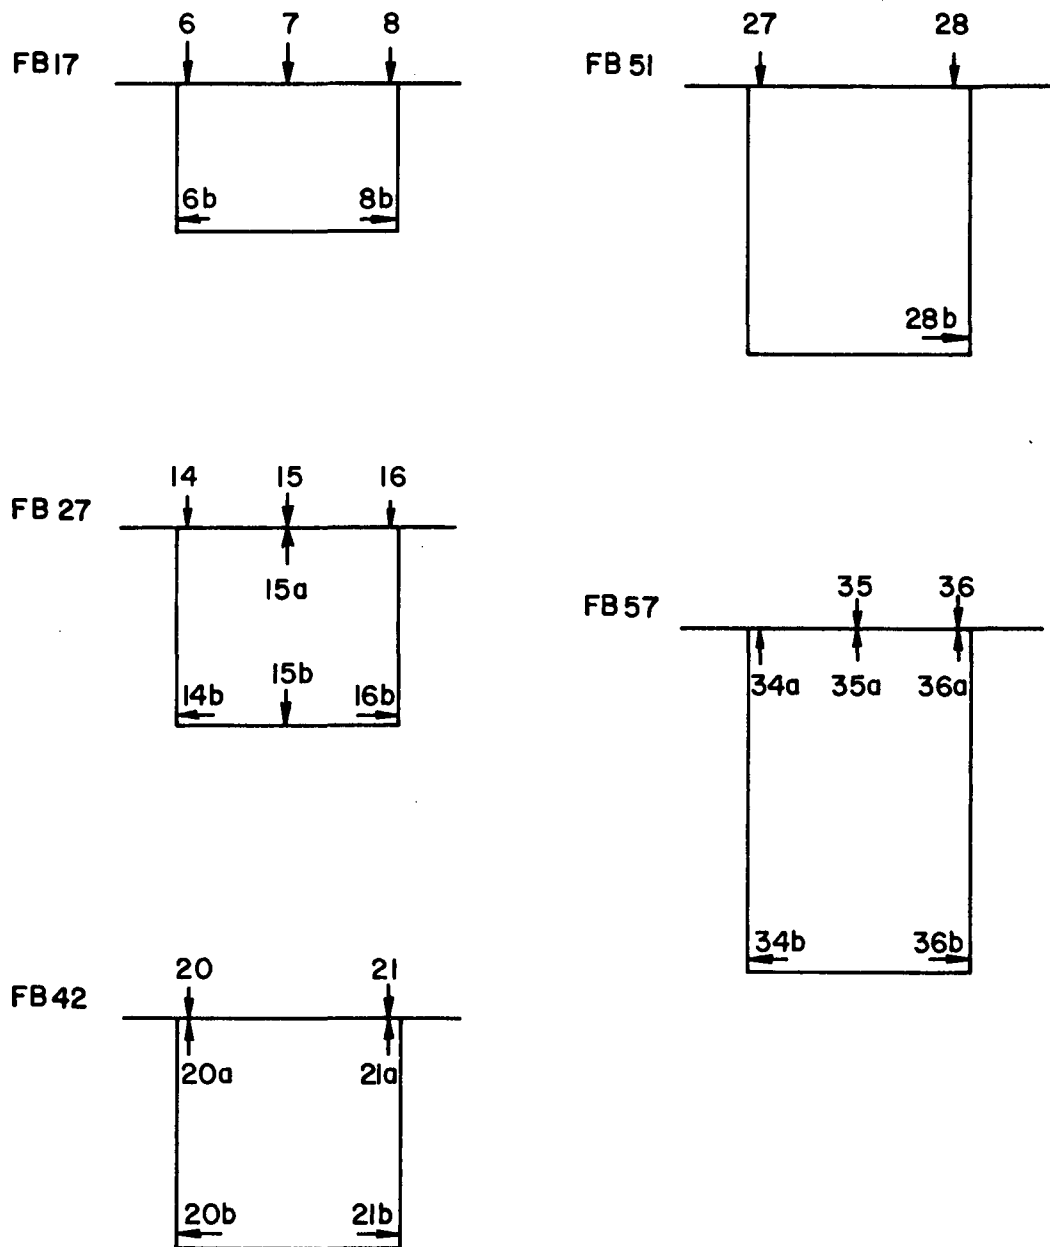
Mechanical Gage Hole Locations (South Box)
